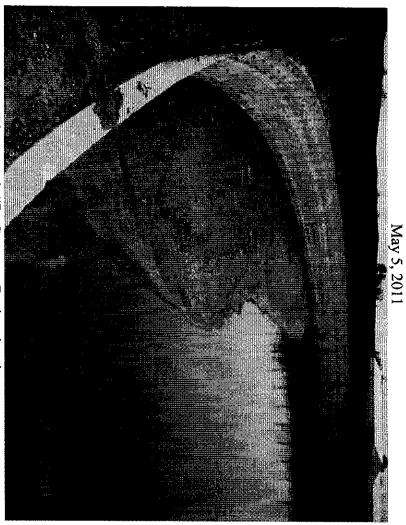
New Gestation Building Tunnel Ventilation. View is south
